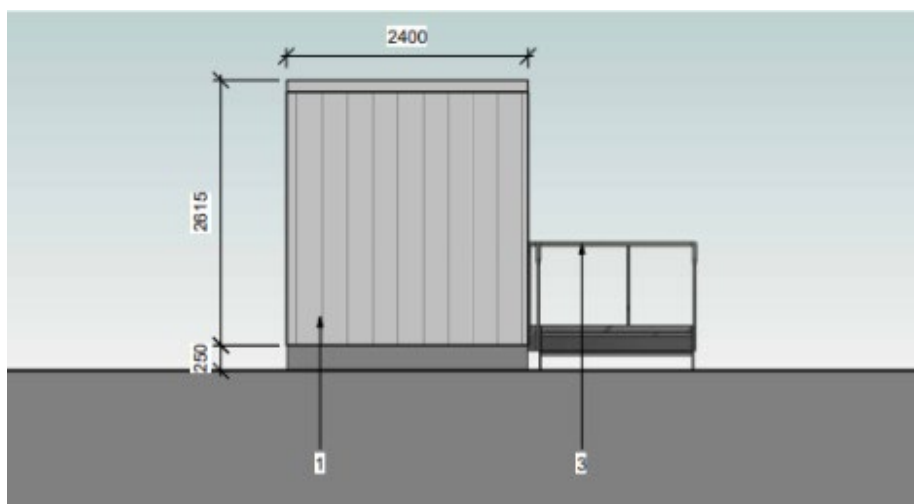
Modular Storage/Workshop Unit North Elevation
